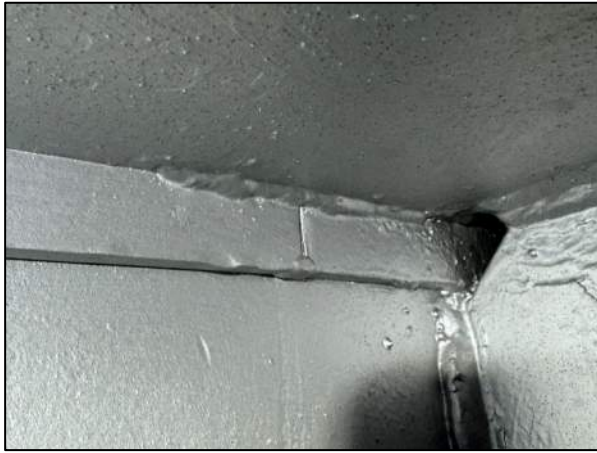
Discontinuous backer bar and varying length stitch welds east of Girder 3 on the top flange of Pier Cap 4.
